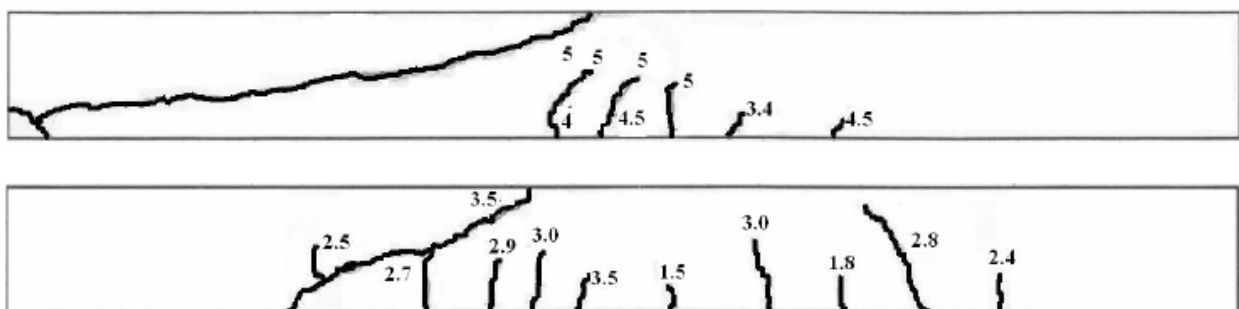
Concrete beam mapped cracks (steel on the top, GFRP on the bottom)
